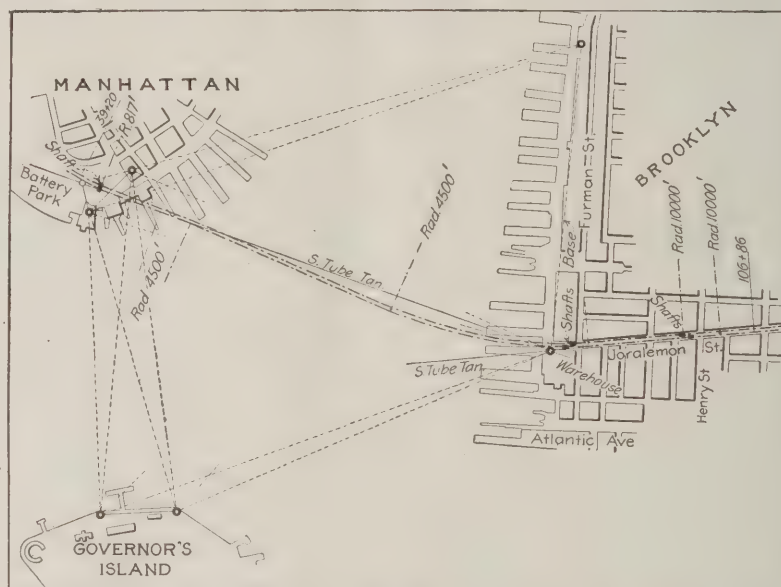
PLAN OF TRIANGULATION SURVEY FOR THE EAST RIVER TUNNEL FROM THE BATTERY (NEW YORK) TO BROOKLYN
